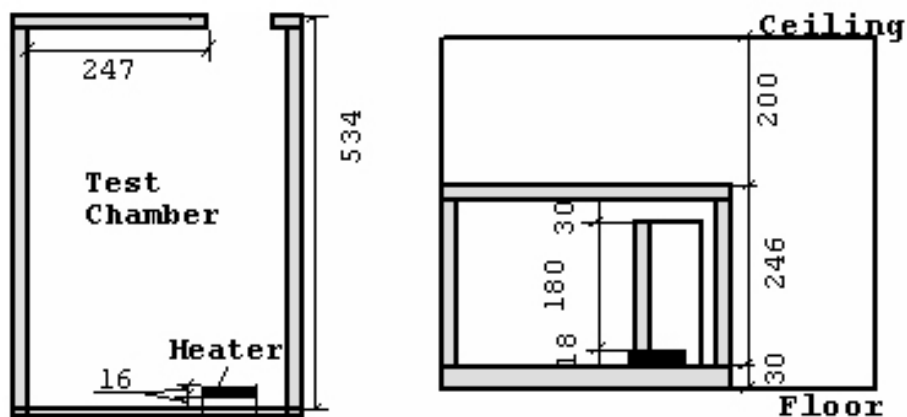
Floor Plan of the 3-D Natural Convection Experiment [Jiang and Chen 2003 (12)]
